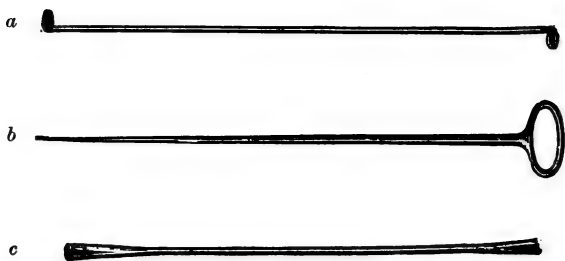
(a) Scraper ; (b) Pricker ; (c) Tamping Rod or Beater.
